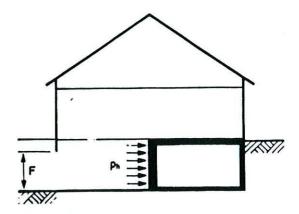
Air blast loads on exterior walls not in contact with the ground.
